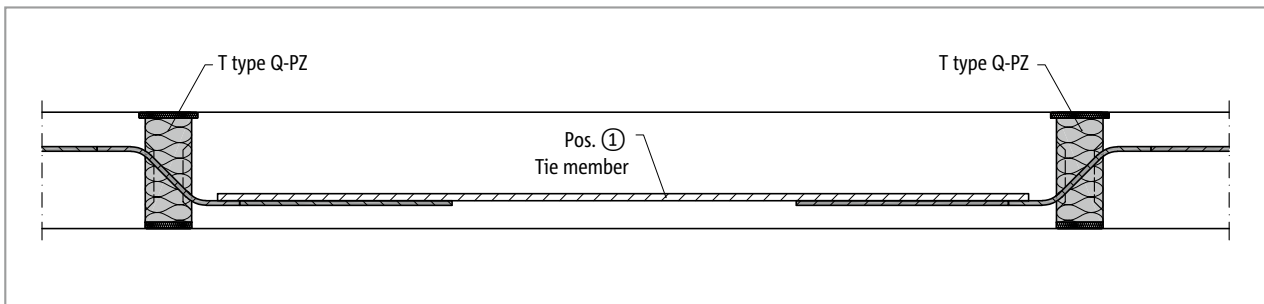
Schöck Isokorb® T type Q-PZ: Tie member connection
